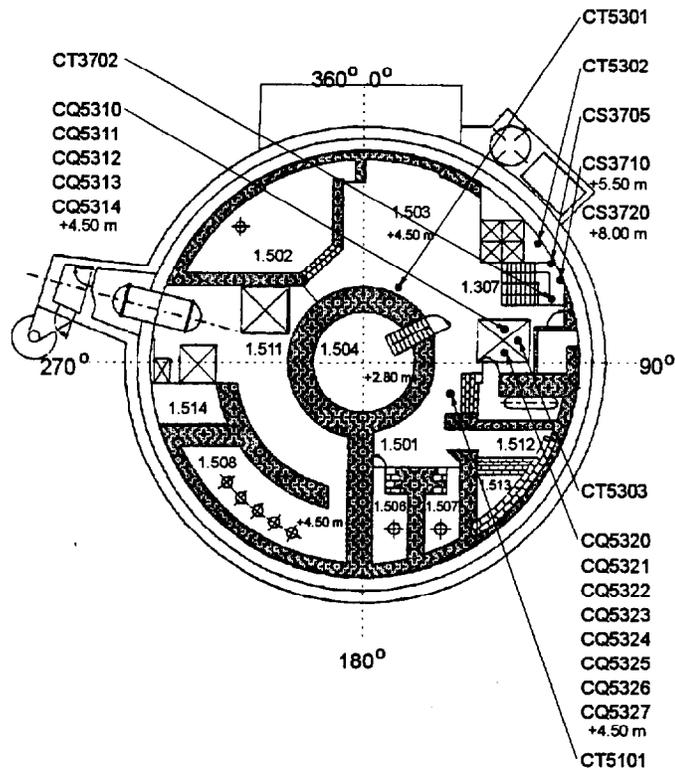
Level 1.500 at the +6.0 m Elevation for T51.1
